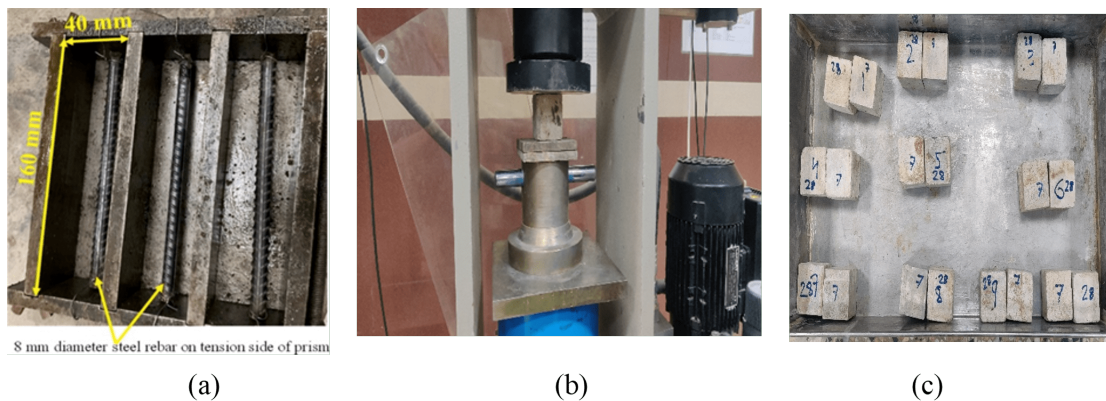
(a) Prism mold (b) compression testing machine (c) sample specimens
